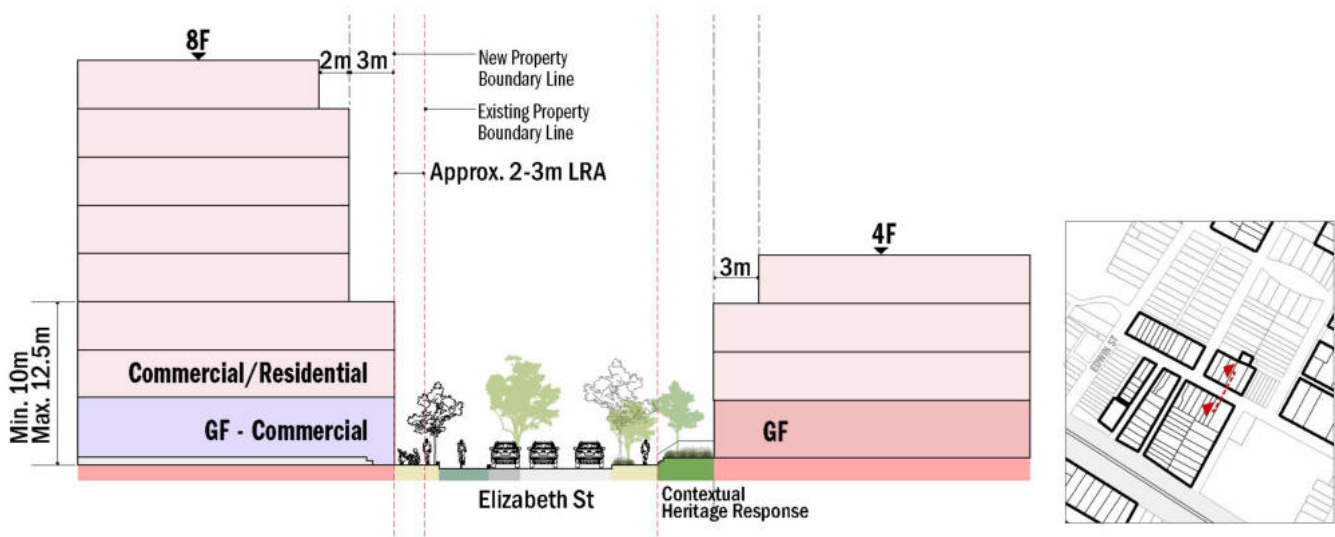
Croydon Centre North – Elizabeth Street west of Etonville Parade Section
